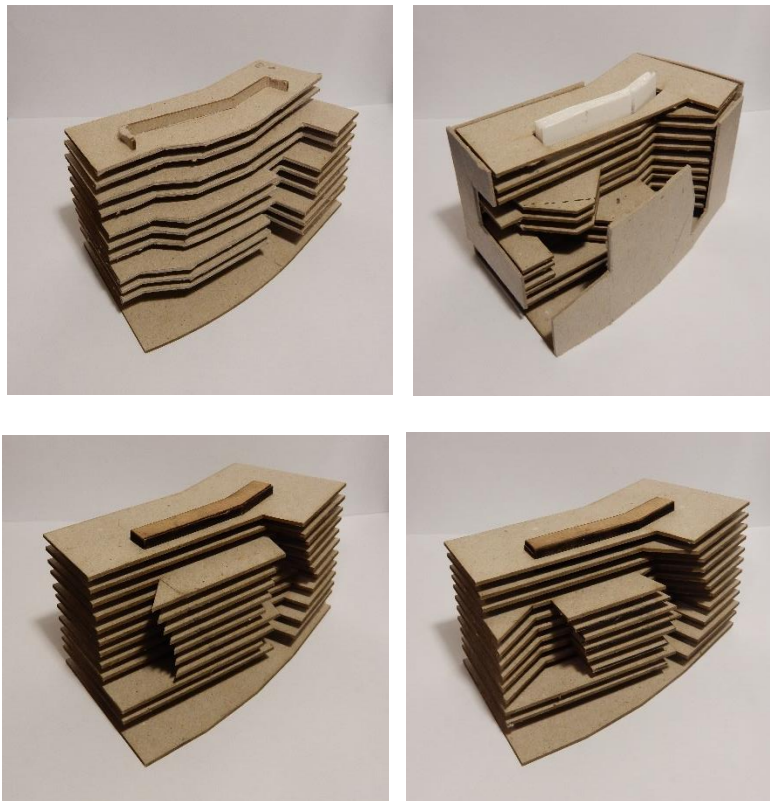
Physical study models of building floor plates shaped for sunlight penetration
